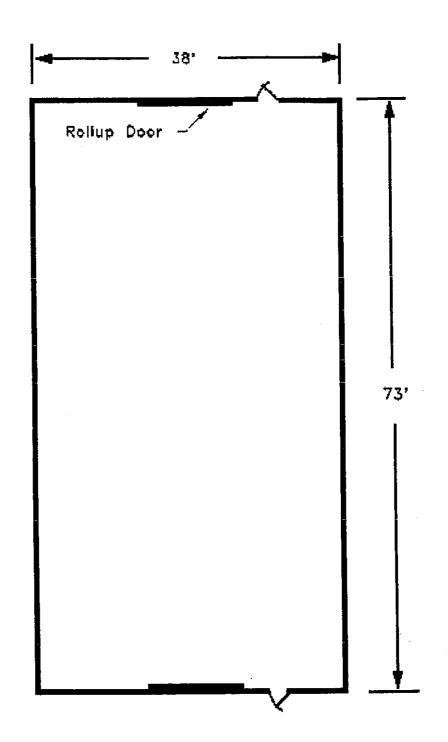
SWSA 6 Staging Facility, Building 7878.
